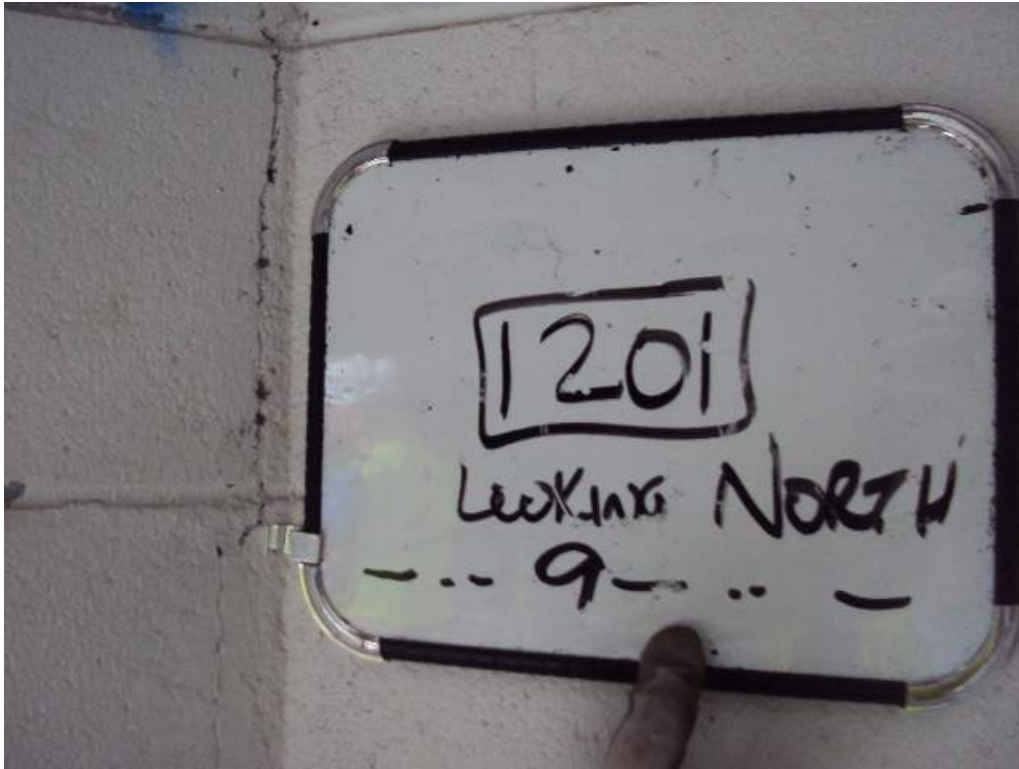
1st Floor – Room 1201– Adjacent to col line 9S– Looking North –Vertical cracks at CMU wall corner
